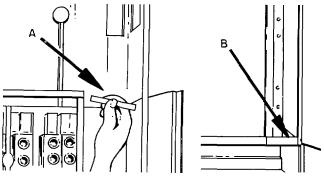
Remove top and bottom horizontal barrier extensions (A and B) to facilitate lay-in wiring in the vertical wire trough
